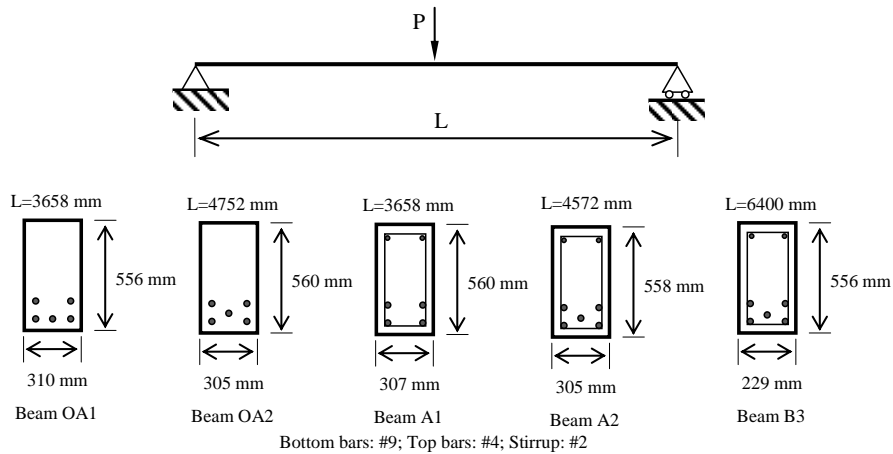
Geometry and steel reinforcement details of shear beams by Bresler and Scordelis (1963)
